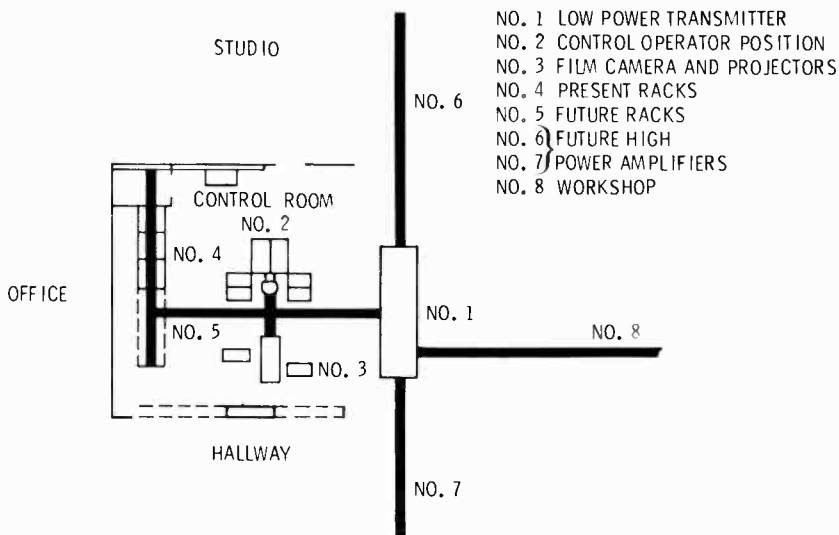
The layout of control room equipment. The broad, heavy lines show the location of wiring ducts in the floor.
